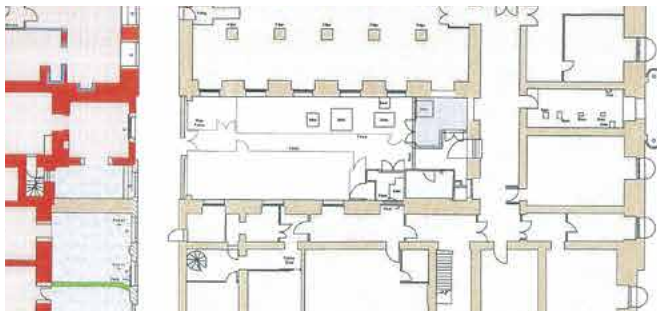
Level 01 Historical Development Plan (extract from Conservation Plan)
